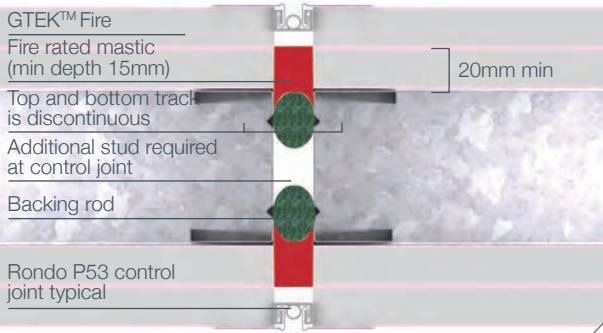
CONTROL JOINT - WALL FRAME SINGLE LAYER
